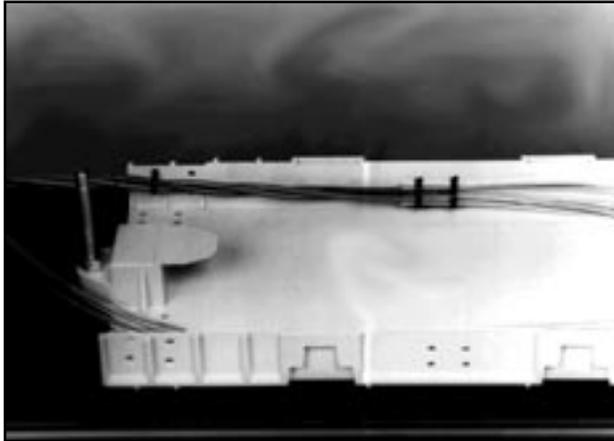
B - MARK BUFFER TUBES FOR LEFT SIDE CABLE ENTRY
